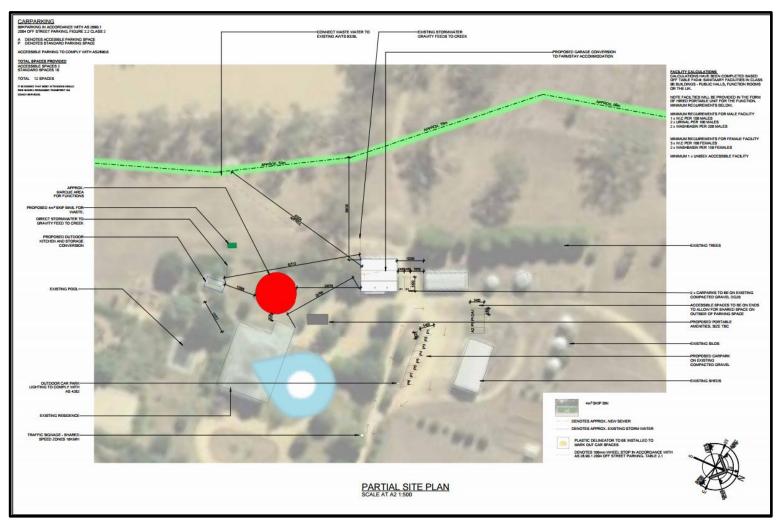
Existing and Proposed Site Plan for Farm Stay and Function Centre Land Use – Lot 4 (Source: Reward Character Designs)
